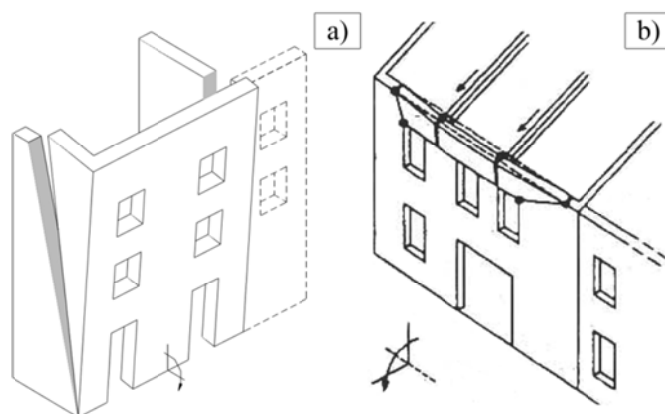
Local failure of masonry based on limit analysis: overturning of facade (a) and of portion of wall under thrusting roof (b) (NIKER Project 2010a).
